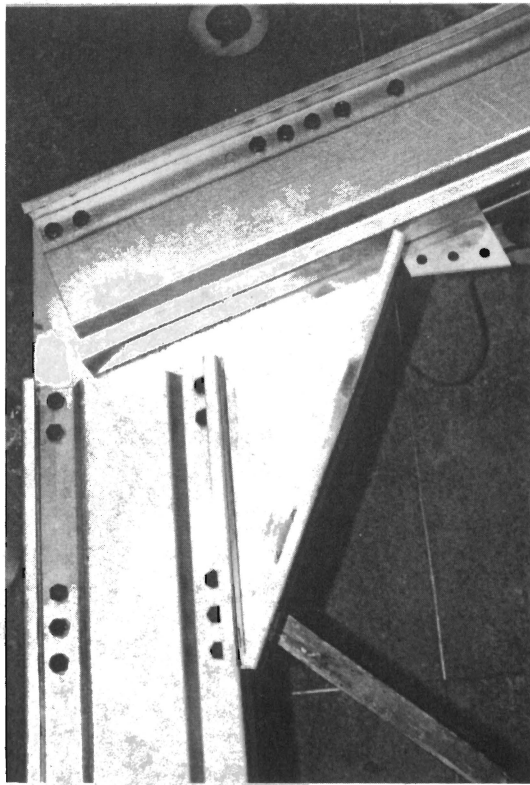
Rafter-to-column connection with outwardly lipped edges at innerside of the connection plate and fin plate for tie bar above the plate corner.
